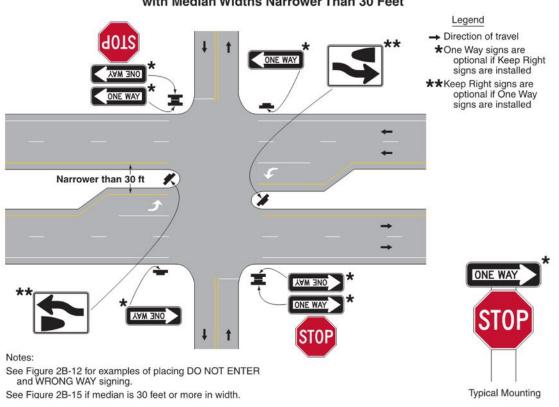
B-16. ONE WAY Signing for Divided Highways with Median Widths Narrower Than 30 Feet
